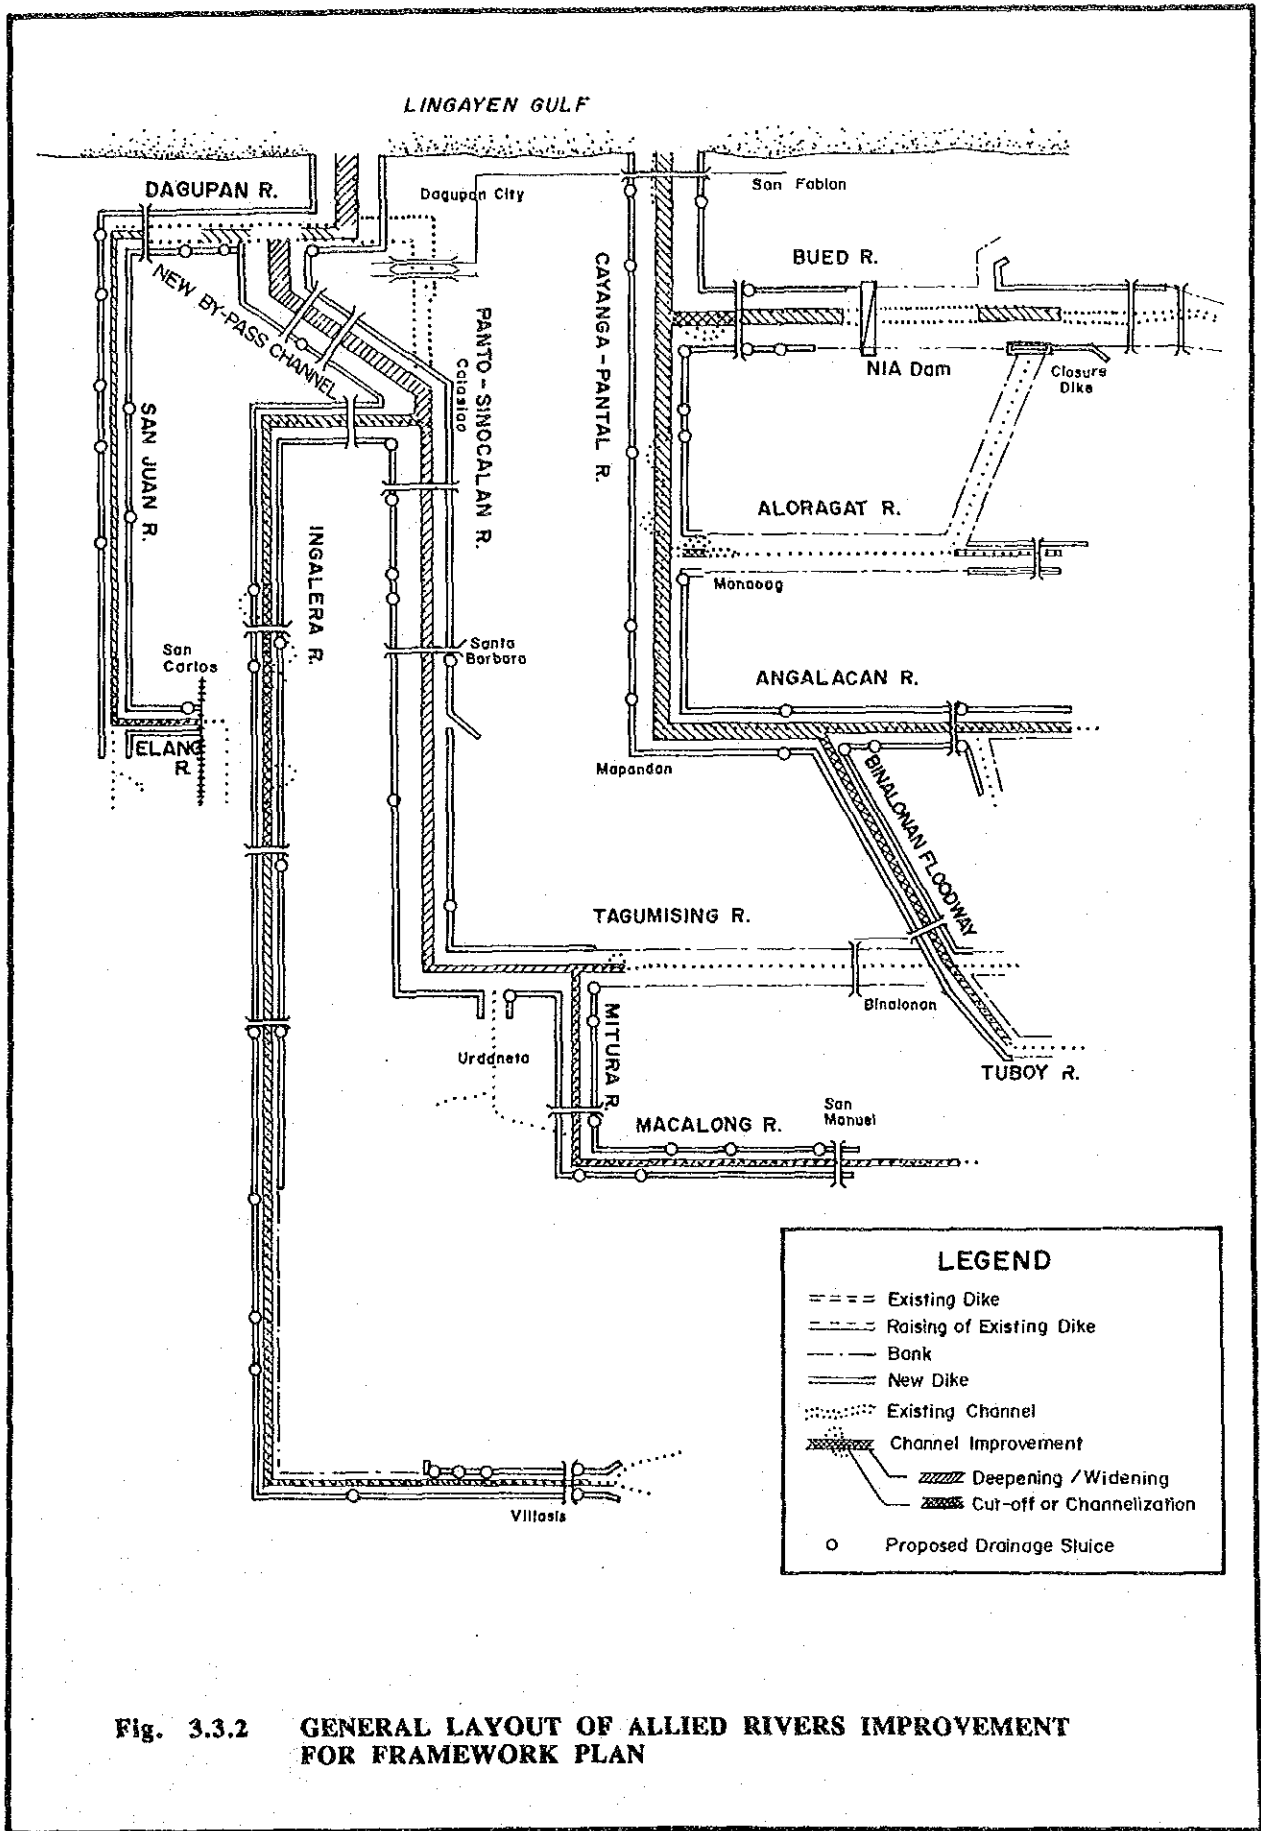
GENERAL LAYOUT OF ALLIED RIVERS IMPROVEMENT FOR FRAMEWORK PLAN
